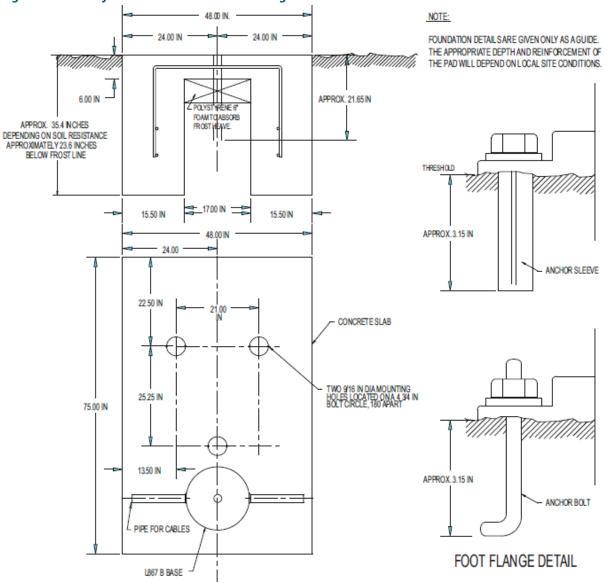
PAPI Style B Master and Slave Three-leg Foundation Detail
